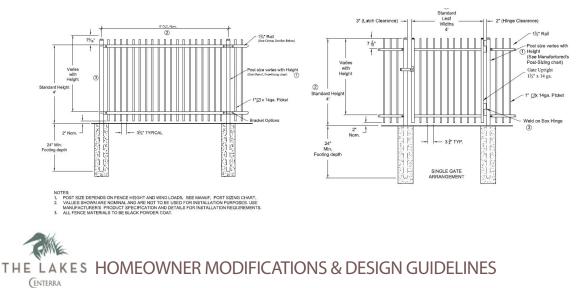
H - Trio Falls Drive Townhomes Fence Detail See Section 2.9.5 for Details
